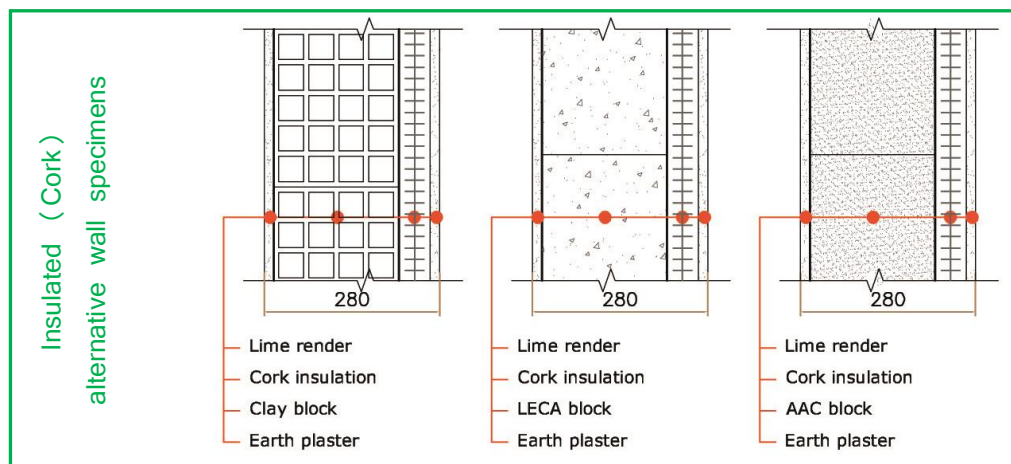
Detail of the construction layers of wall specimens insulated with cork, dimensions in mm
